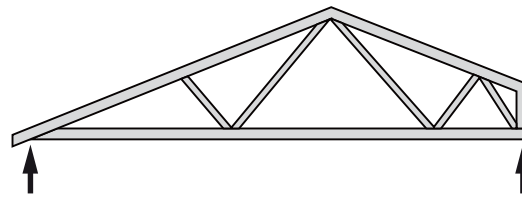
shows typical truss shapes. The number and position of webs varies with truss size and loading.
